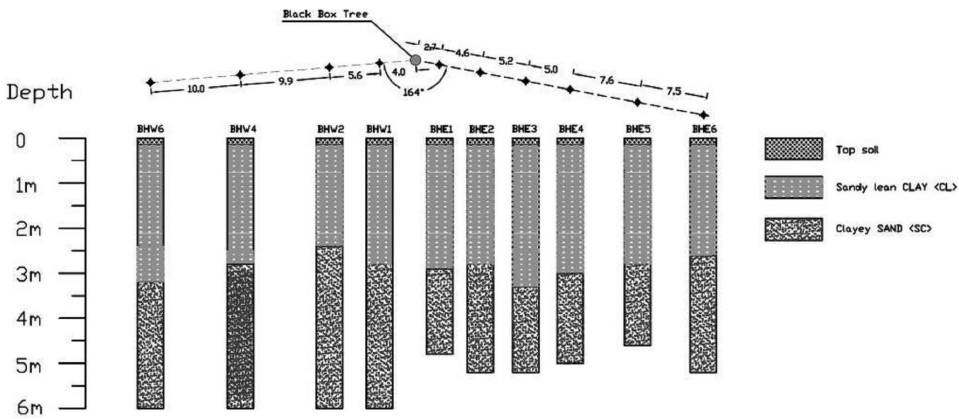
Geotechnical section of Miram site (Fatahi [1]).
